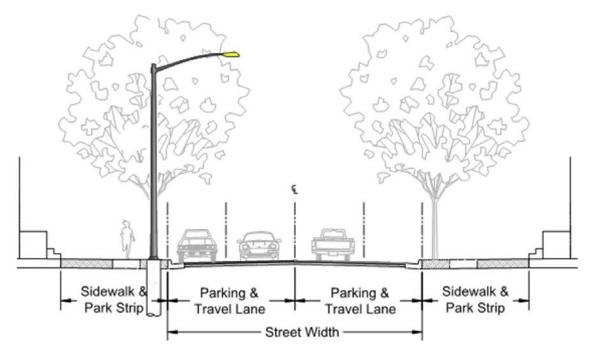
Typical Local Street with Intersection Only Lighting Cross Section
